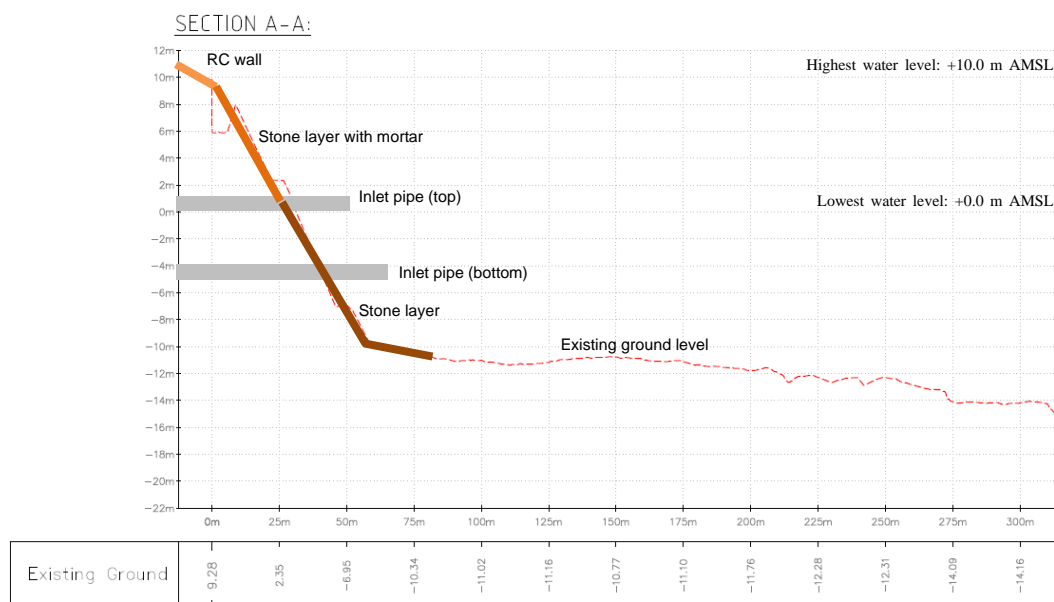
Outline Section of Proposed Protection of Revetment and Riverbed for Nirodh Phase III and Koh Norea
